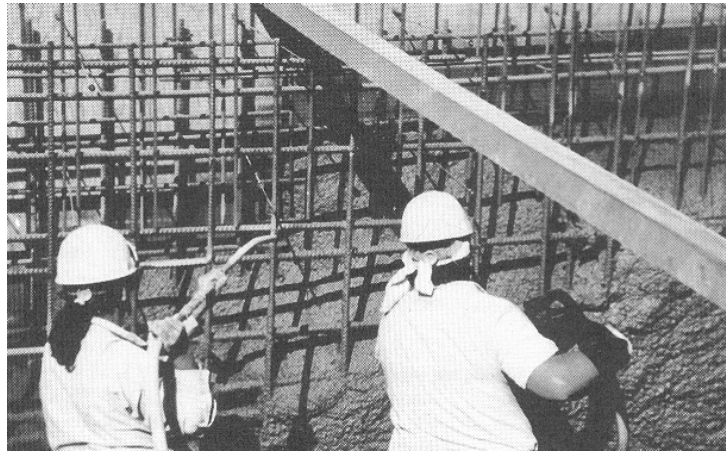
Shotcrete being applied to a wall (Sabnis, Shroff et al., 1996)
